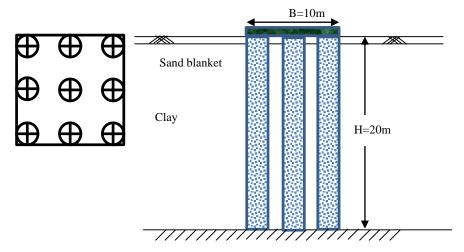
Layout of a rigid footing on a group of stone columns in the clay layer of 20m thickness
